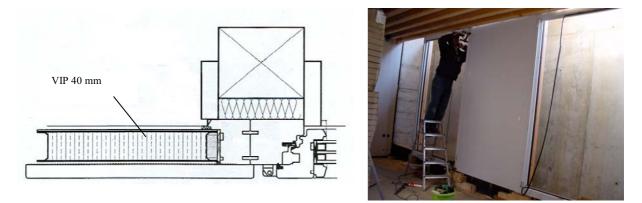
Vacuum insulation panels in the form of stainless steel cases used as outside wall elements on single-family terrace houses in Binningen / Switzerland Left: Horizontal section through the construction Right: Installation of the VIP (Architect: Ecinor Postolozzi, Posel (Switzerland; Eccade system; Höring AG, Switzerland)
